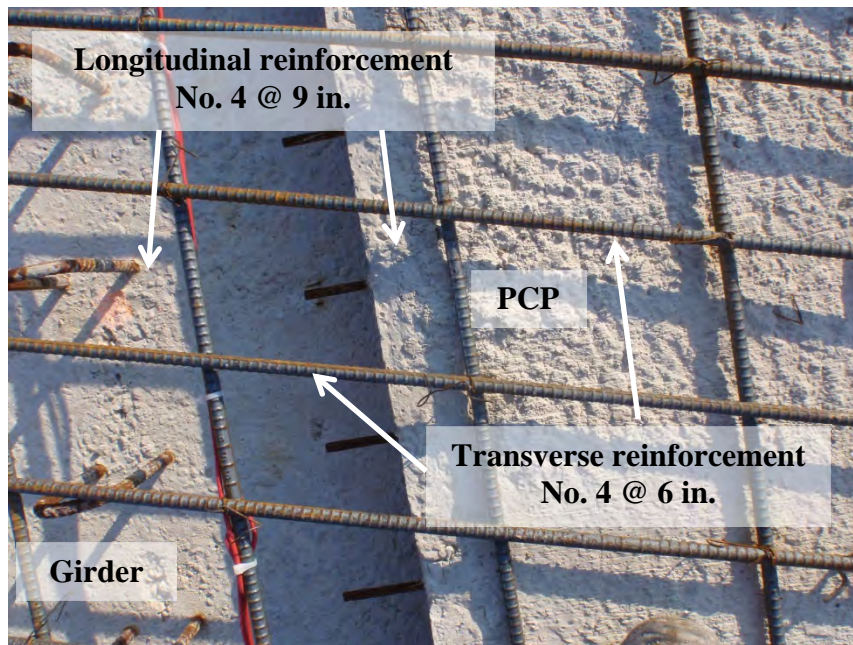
Typical placement of reduced deformed-bar reinforcement, Lampasas River Bridge
